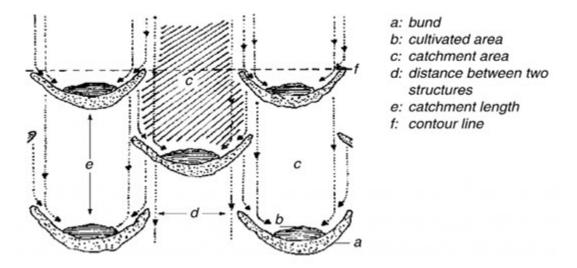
Layout of Semi-Circular Hoop. (Source: Barron and Salas 2009)
